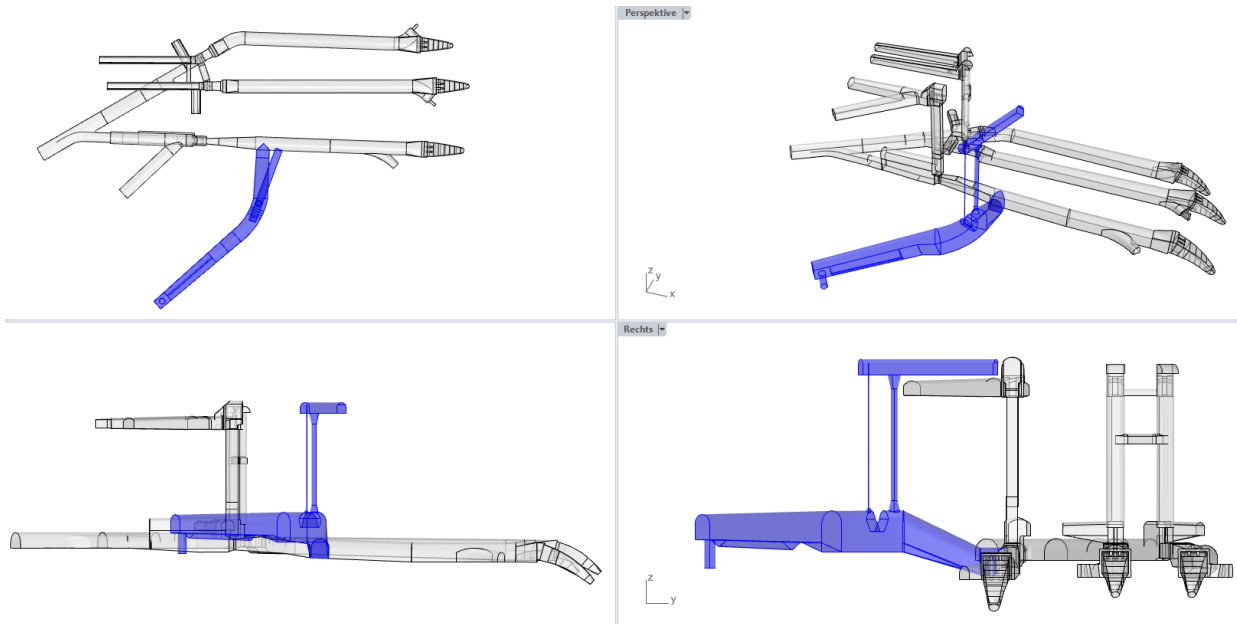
Geometry, final proposal extension chamber Tonstad with semi-air cushion at existing Tonstad system, views
